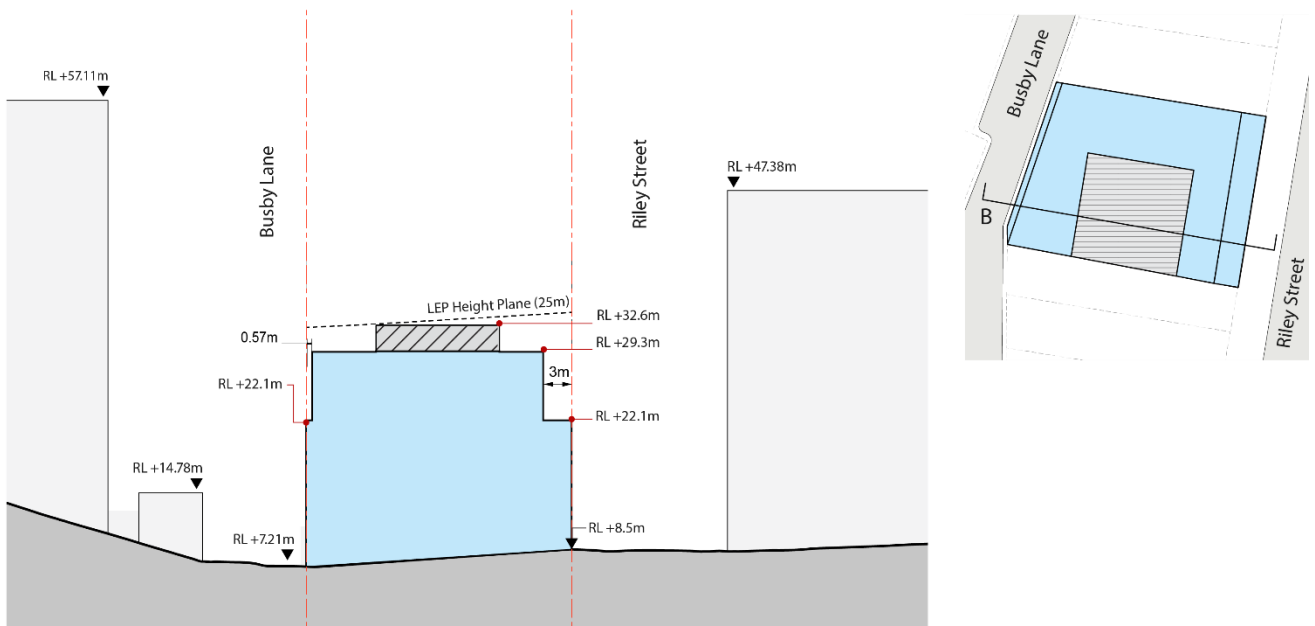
X 47-51 Riley Street, Woolloomooloo – Maximum Building Envelope Section B (hatched area represents an allowance for roof top structures under the LEP Height control)
